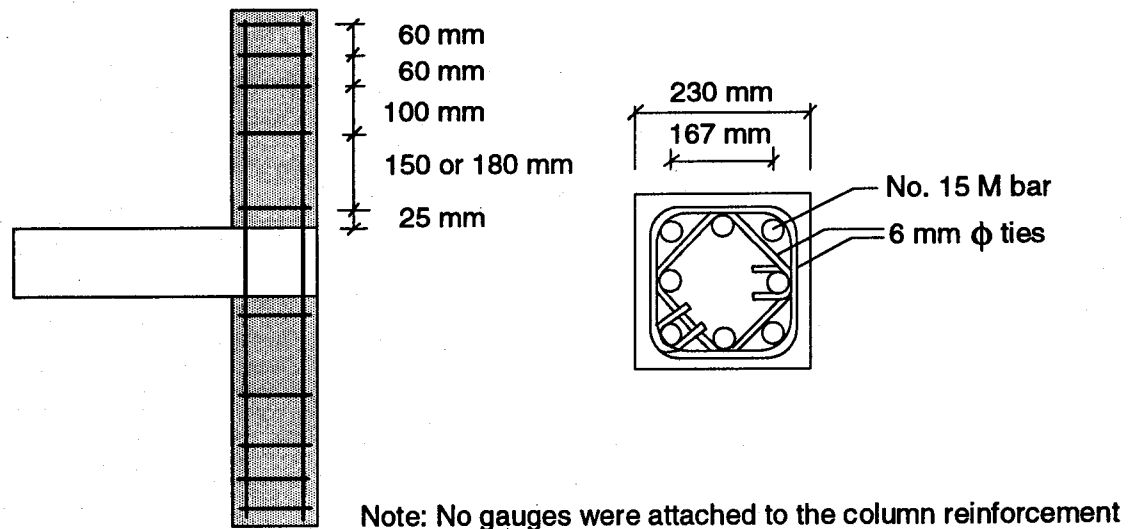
Column Reinforcement Layout (Series C Specimens)
